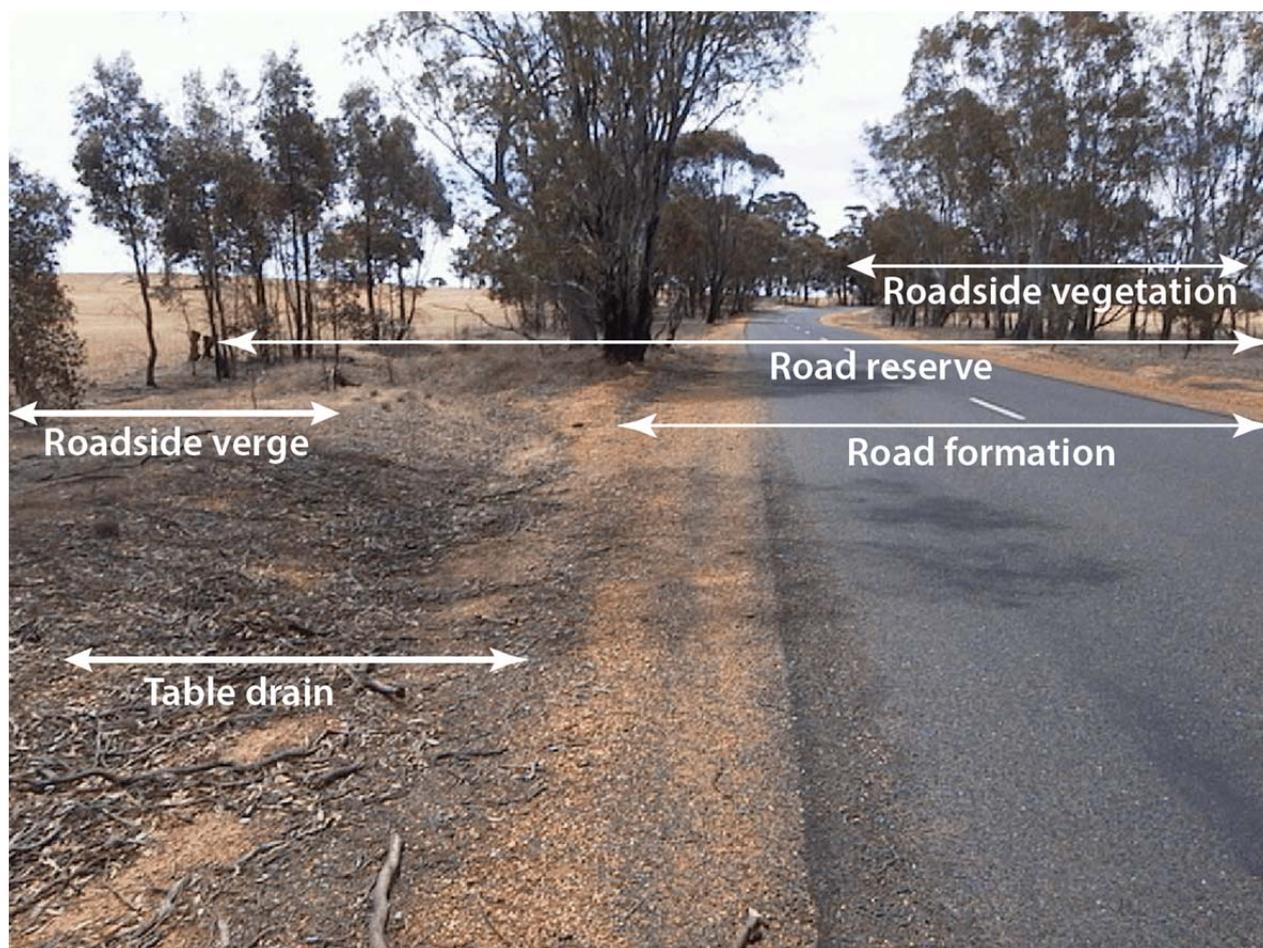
The components of a roadside: road reserve, road formation, road drainage system, roadside verge, vegetation and adjoining property
